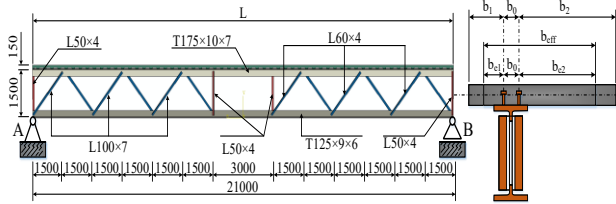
Preliminary cross-section of the composite steel-concrete truss member
